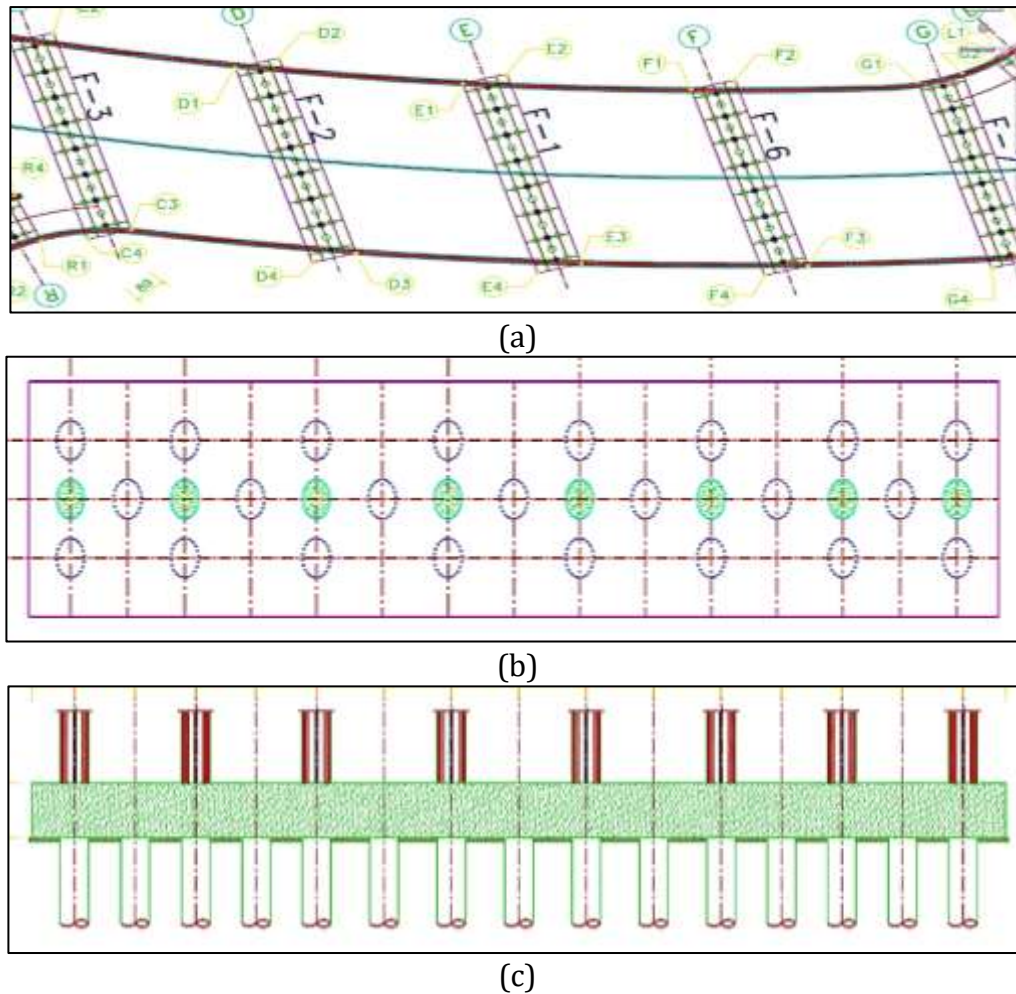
AutoCAD plan of Al-Mafraq bridge (a) Top view of the bridge, (b) Top view of the pile cap, (c) Piles, pile cap, and columns. (Engineering Consultancy Bureau 2011).
